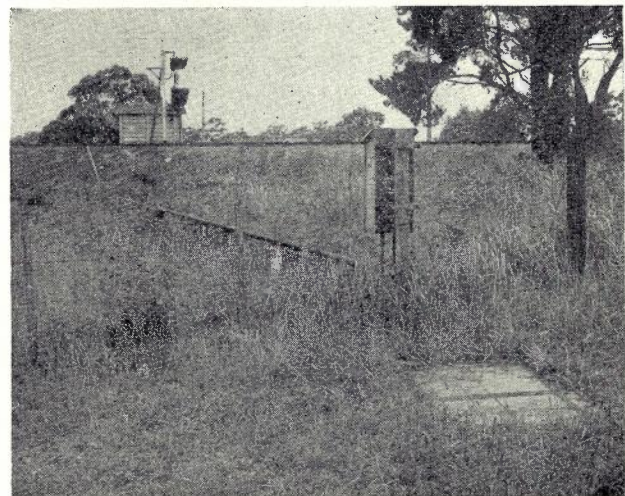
Typical Drainage Bond from Cable to Railway Rail.
